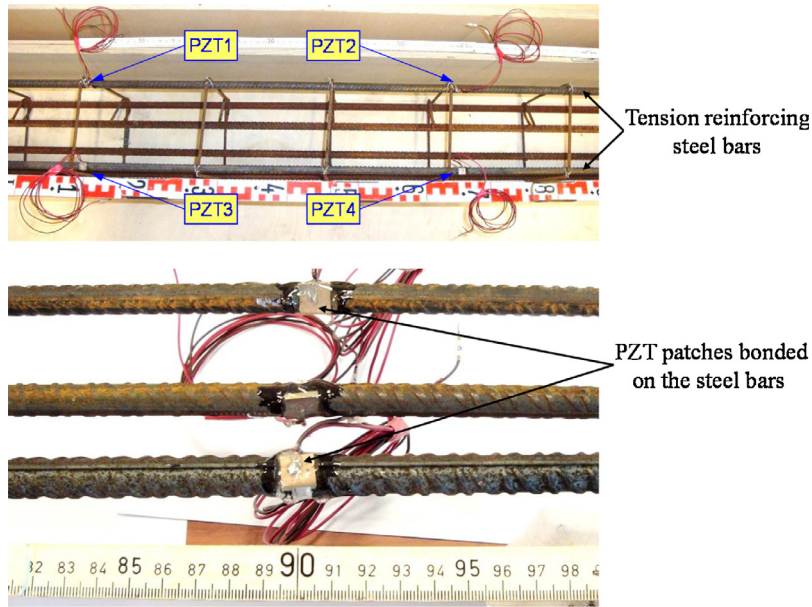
Bonded PZT transducers on the tension reinforcing steel bars of the flexural RC elements before concrete casting.
